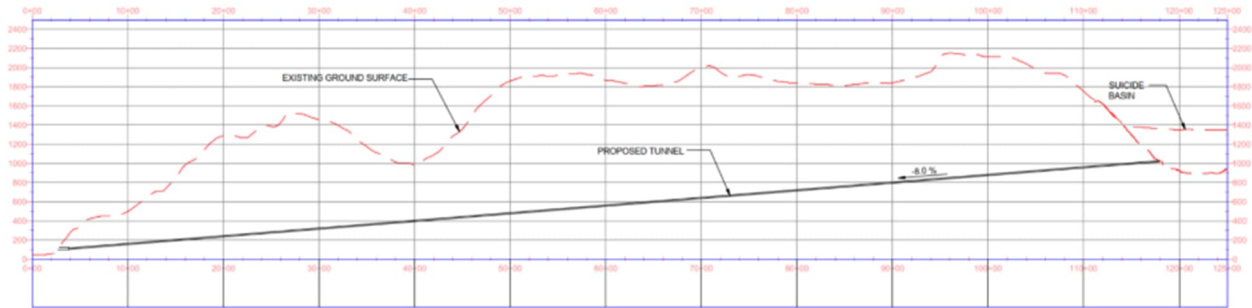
Lake Tap Tunnel Alternative Profile (Intake and Outfall Elevation Subject to Change)
